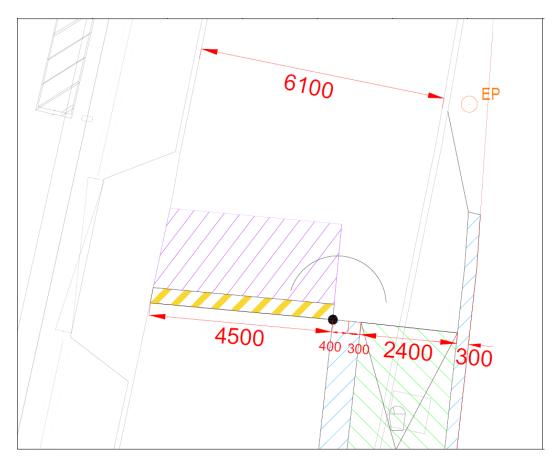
Dimensioned plan view of construction gate line and SHB shared path diversion
